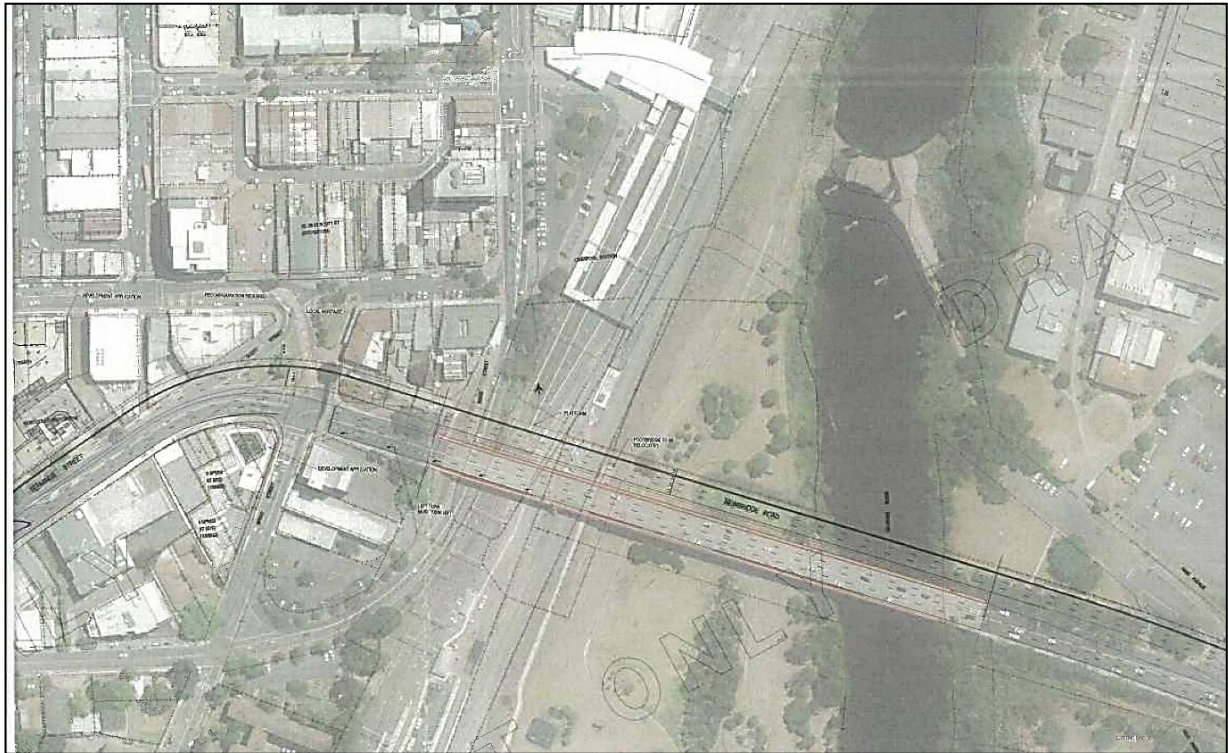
Proposed Terminus Street Road Widening (Aerial View with TfNSW Proposal Overlay)
